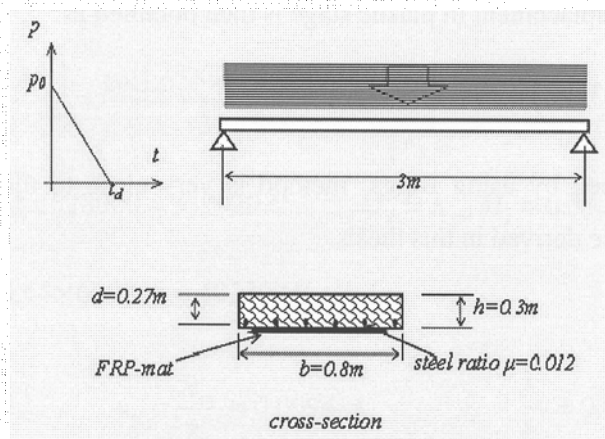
Simply-supported RC beam strengthened with FRP sheet subjected to air-blast loading
